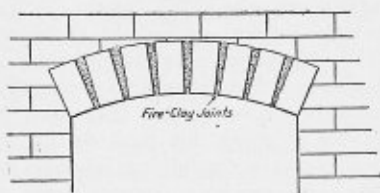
Use of Straight Brick Causes Faulty Arch Construction
